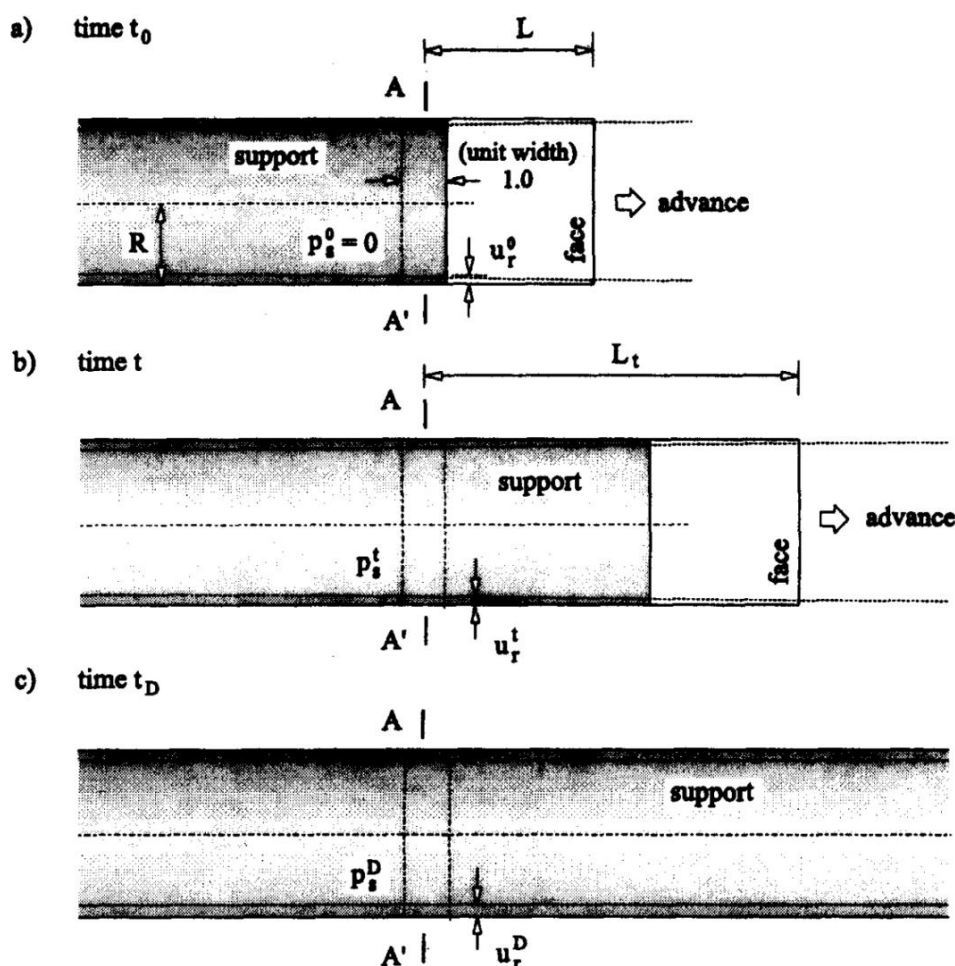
Loading of the support at section A-A' due to progressive advance of the tunnel face (Carranza-Torres and Fairhurst, 2000).
